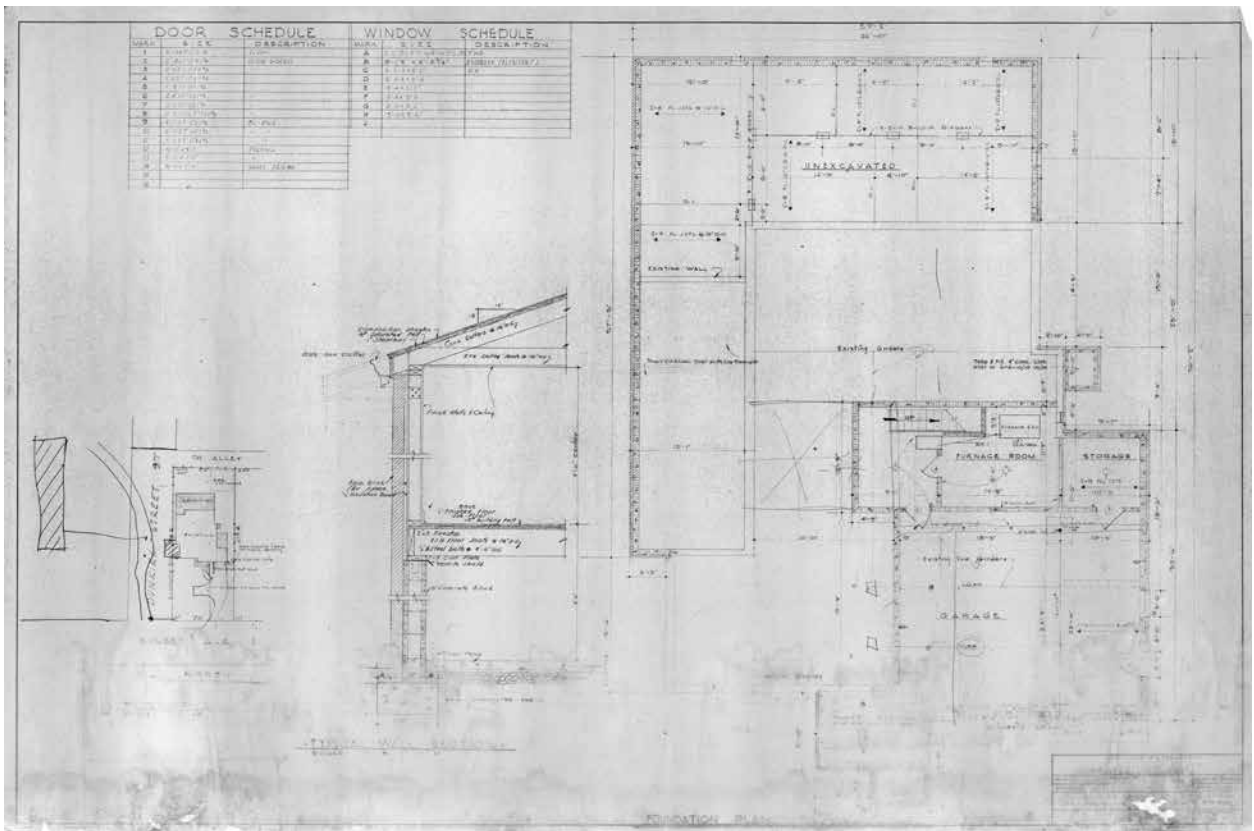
A1 First Floor Plan, Work Schedule, 12/1964, Joseph W Robinson, Designer. (Source: MALU Archives.)
